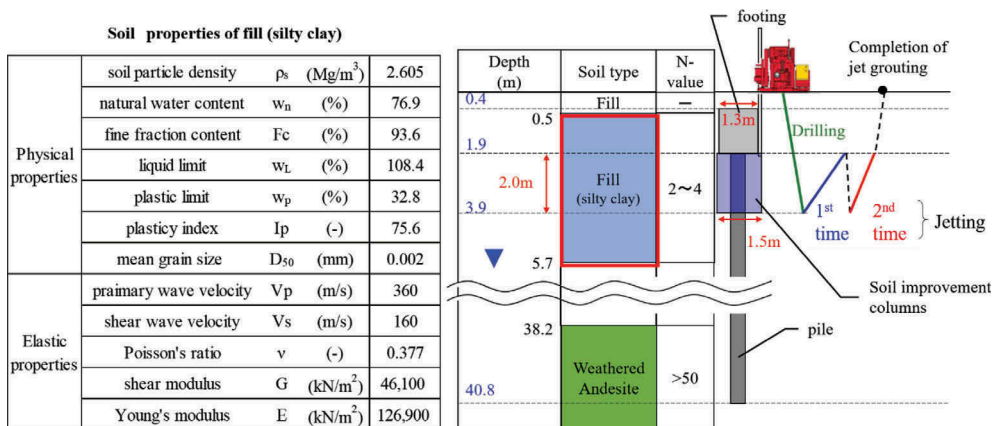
Soil layer of this site with soil properties and details of jet grouting construction
